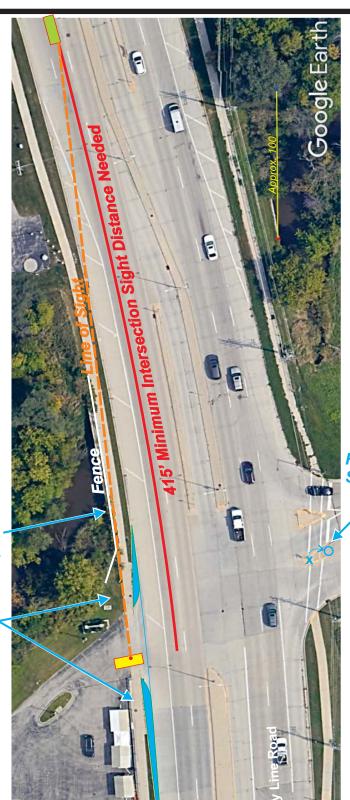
CONCEPTUAL SITE PLAN
